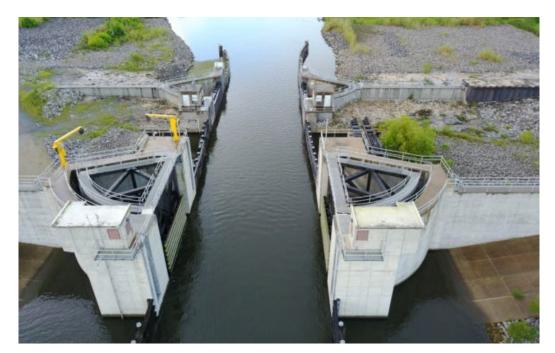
Bayou Bienvenue and Bayou Dupre Sector Gates
